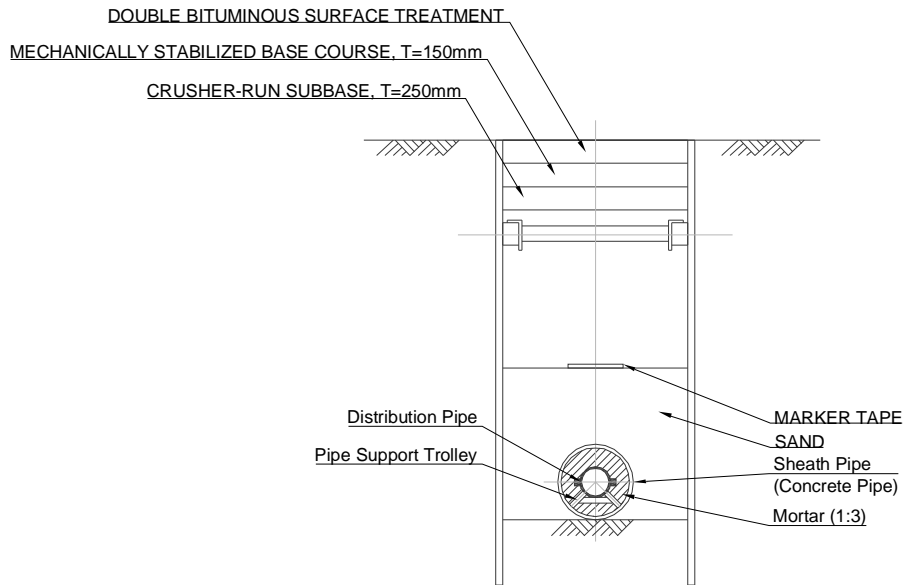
Typical Cross Section of Raw Water Transmission Main (Battambang)
